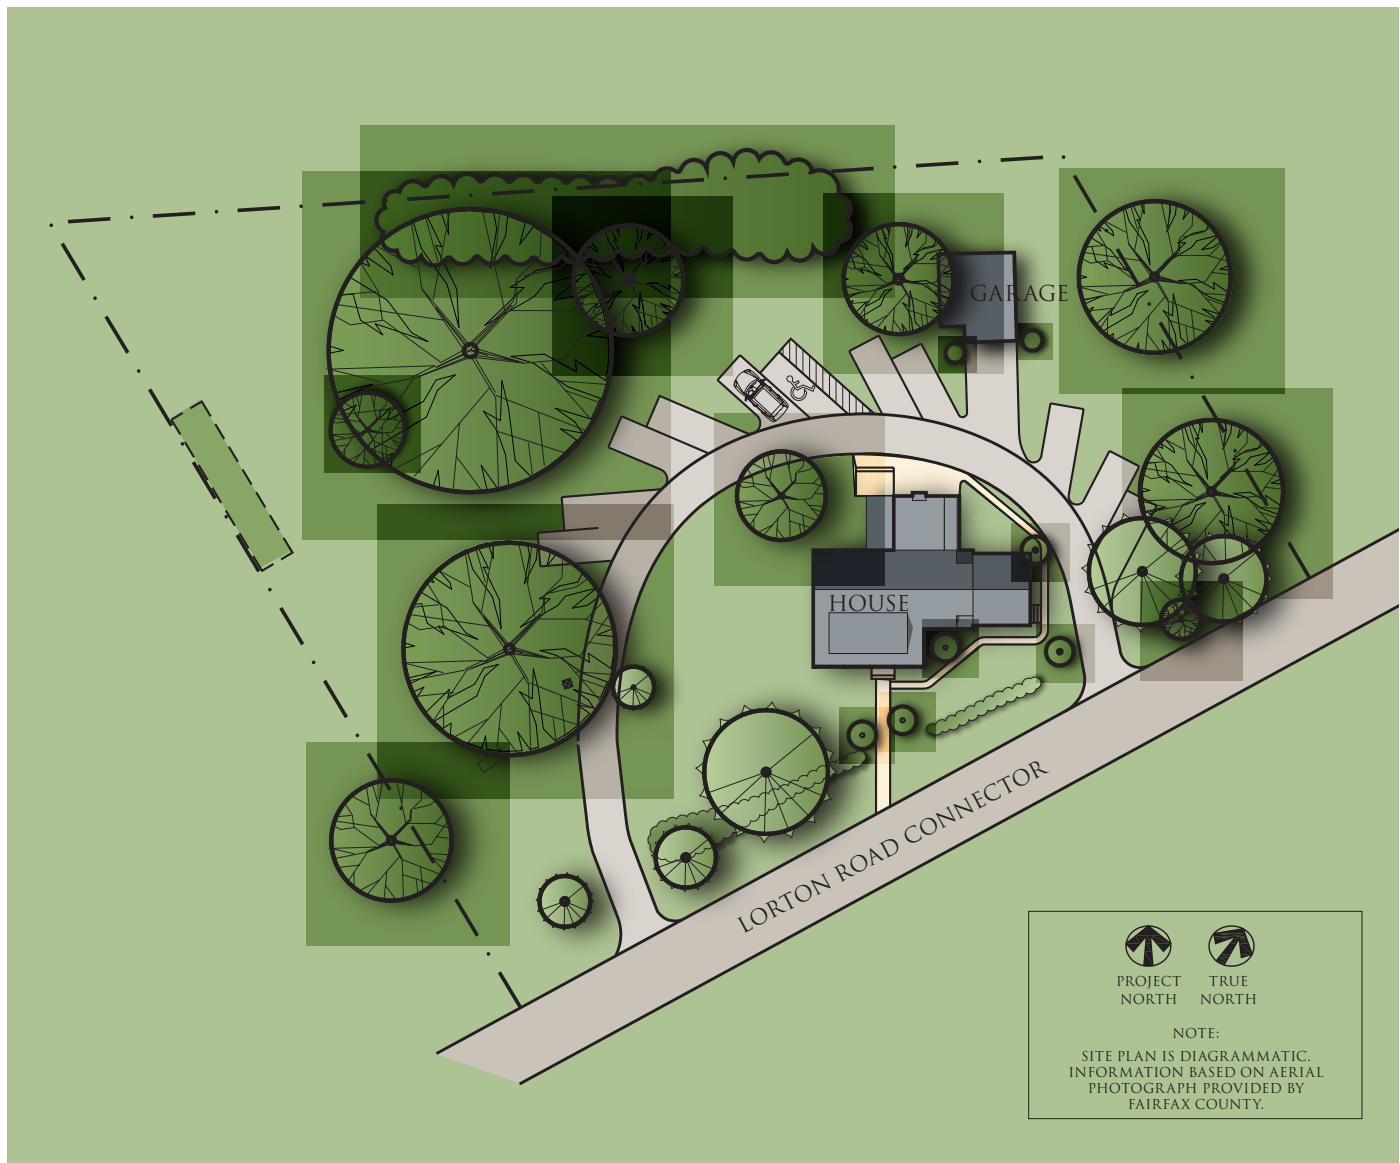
Option A1 provides 11 parking spaces located on the outside of the circular driveway. This arrangement provides ample space to screen and shade the parking spaces.
